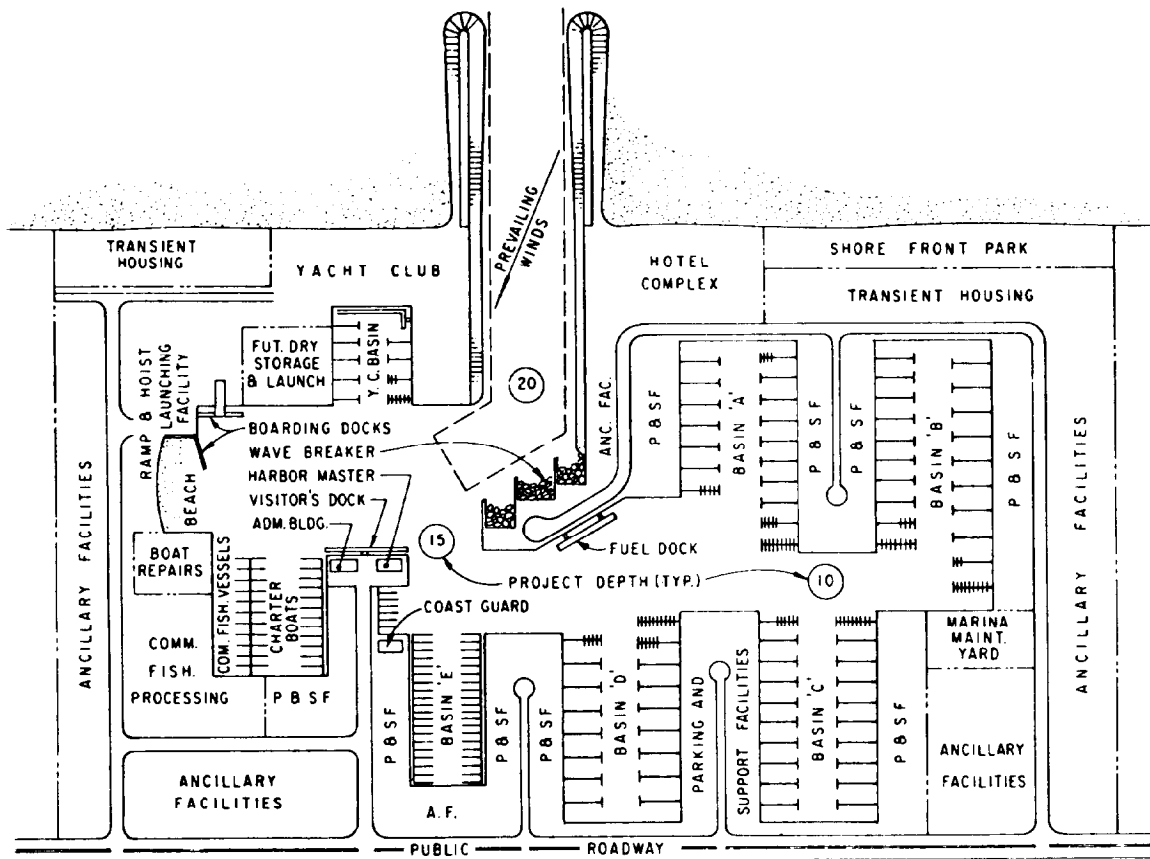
Schematic layout of a marina (for illustration only; not a recommended layout).
